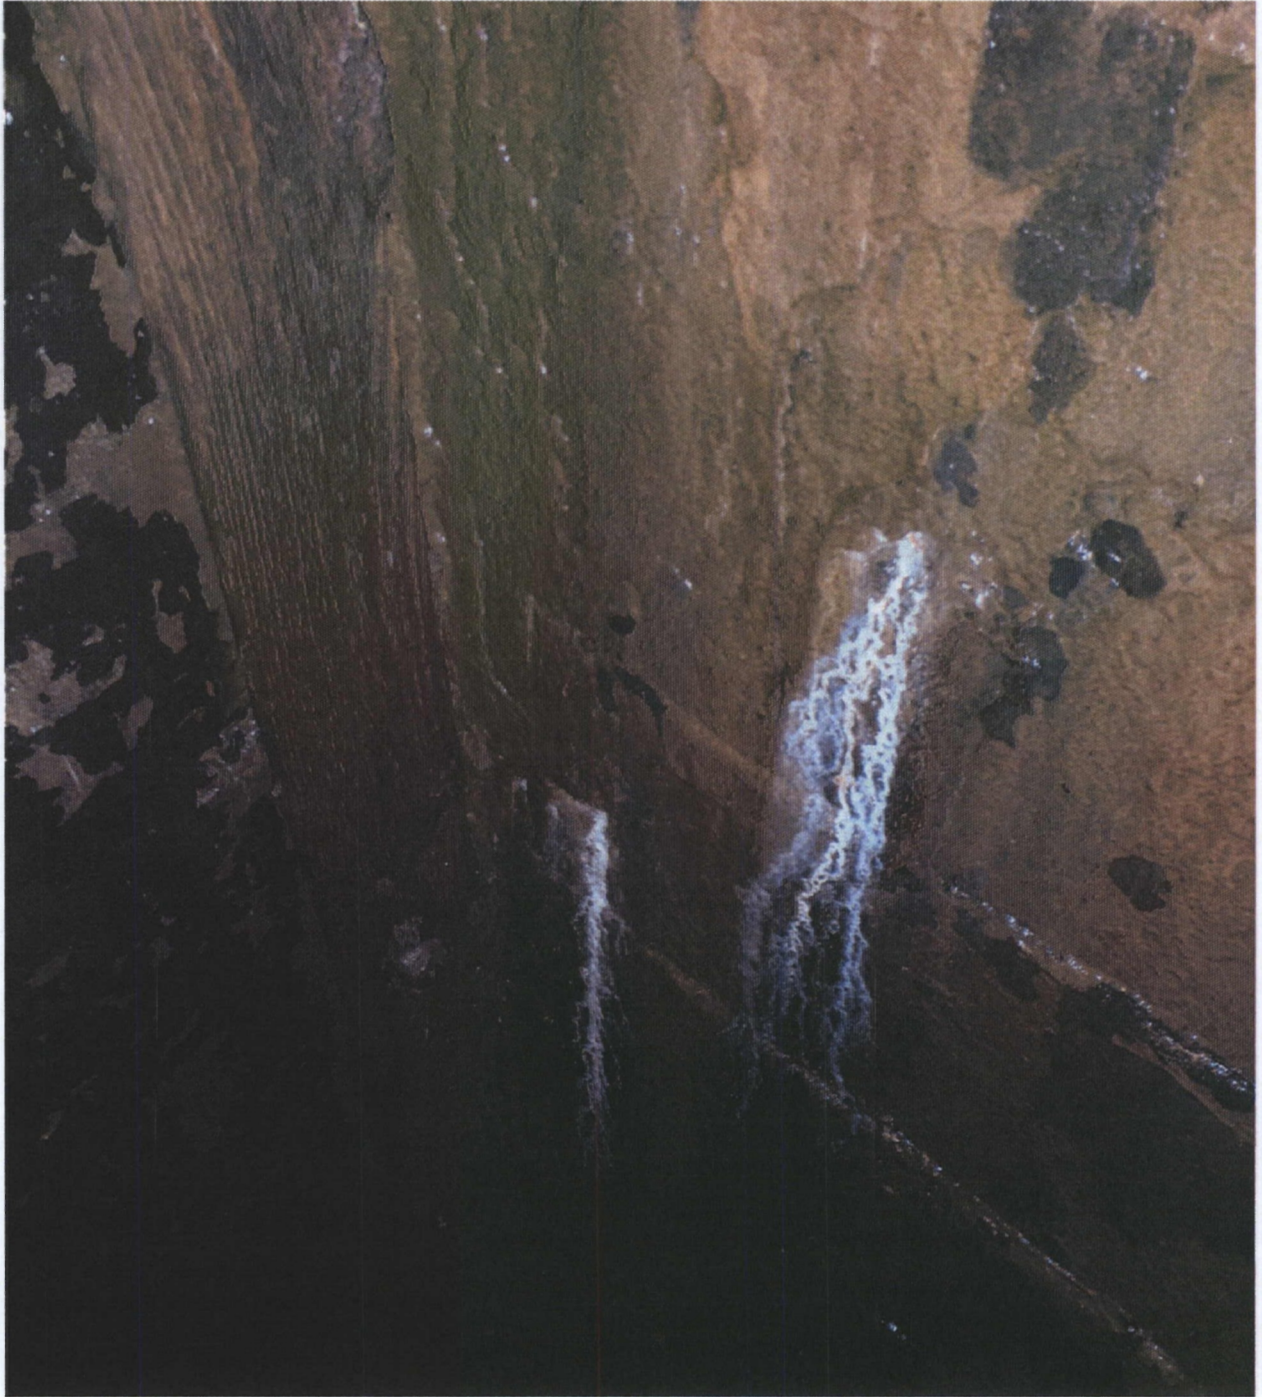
Cracks with sediment infiltrating tower, north shaft, looking northeast
